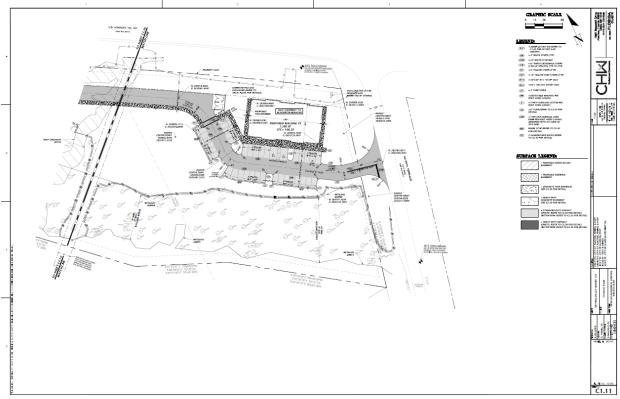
Proposed Landscape Plan for Golf Plaza (Sheet 1 of 2)
